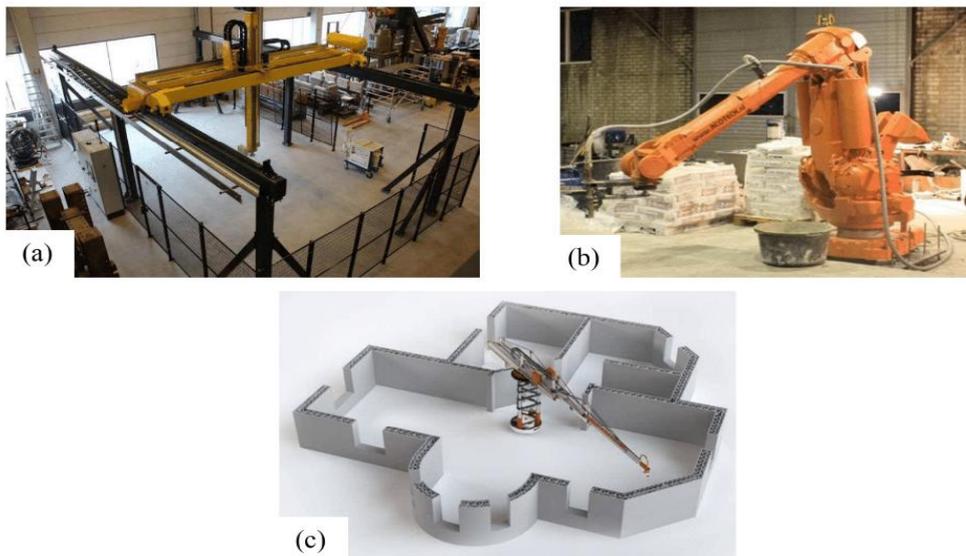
(a) Gantry Printer, (b) Robotic Printer, (c) Crane Printer [5]
